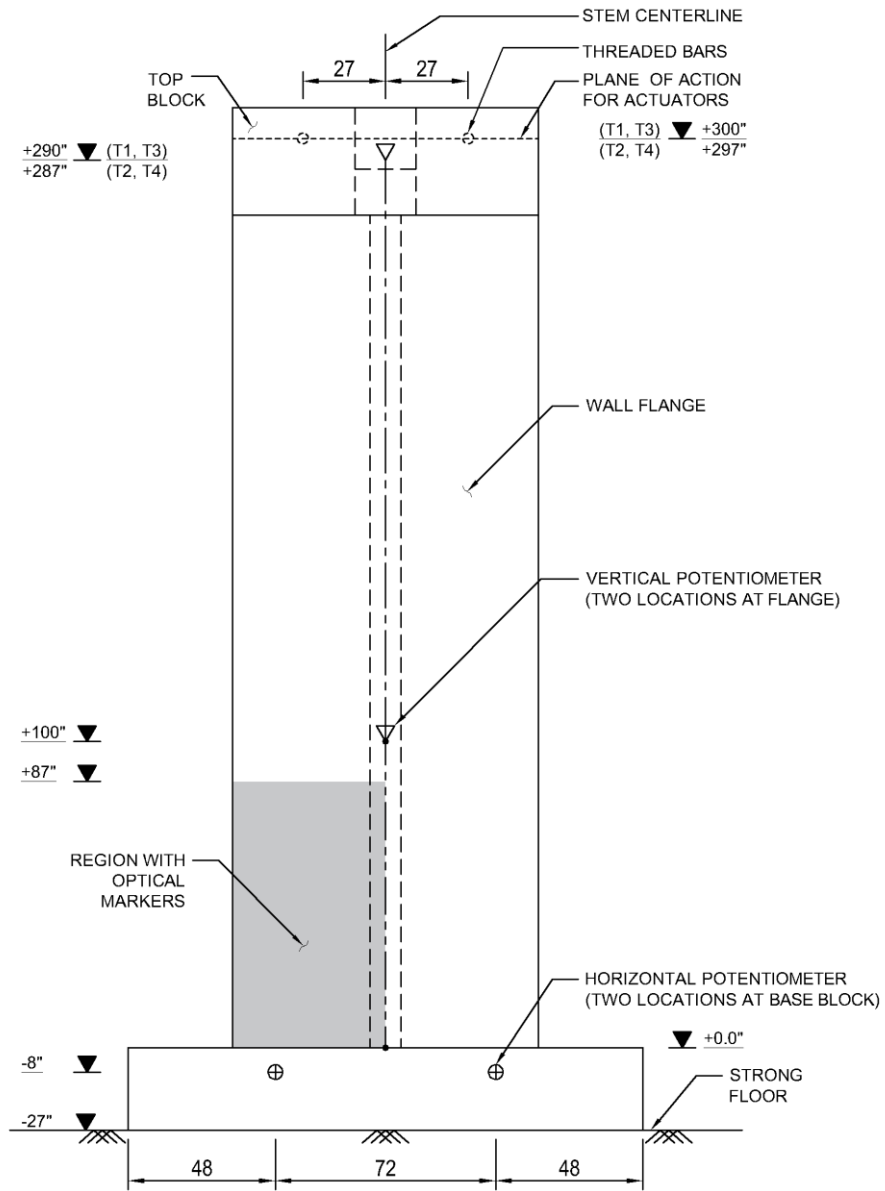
Wall instrumentation (elevation view of wall flange) (1 in. = 25.4 mm)
